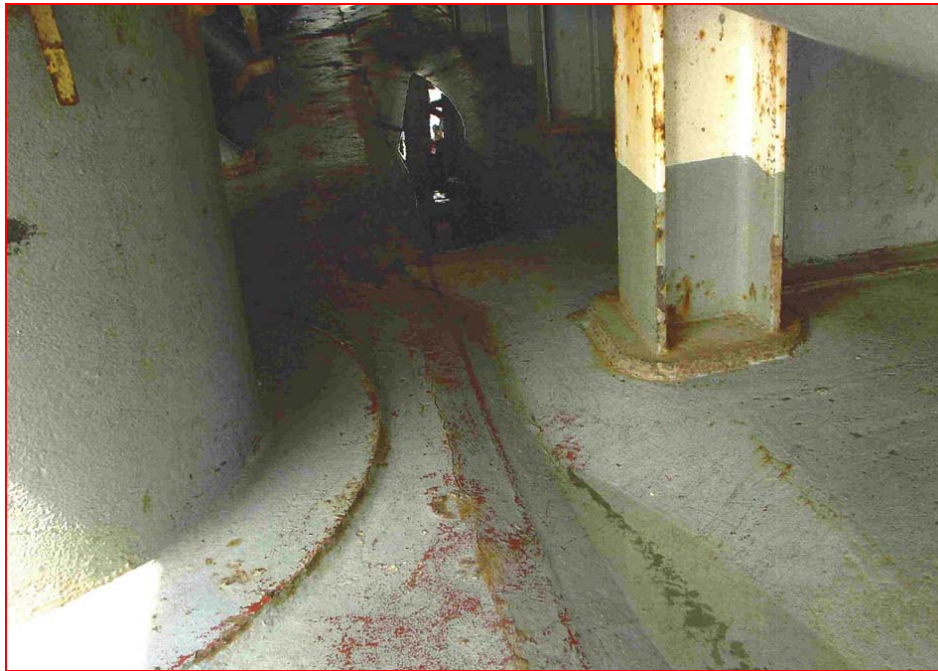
Hull Structural Inspections: Near the jacking tower some buckling of the main deck appeared to occur. One centerline tank was reported flooded.
